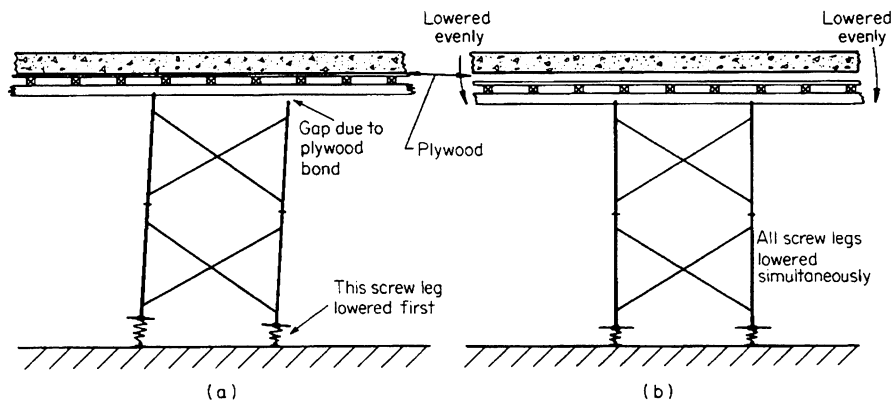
Stripping a Shoring Tower: (a) Poor Method and (b) Better Method
